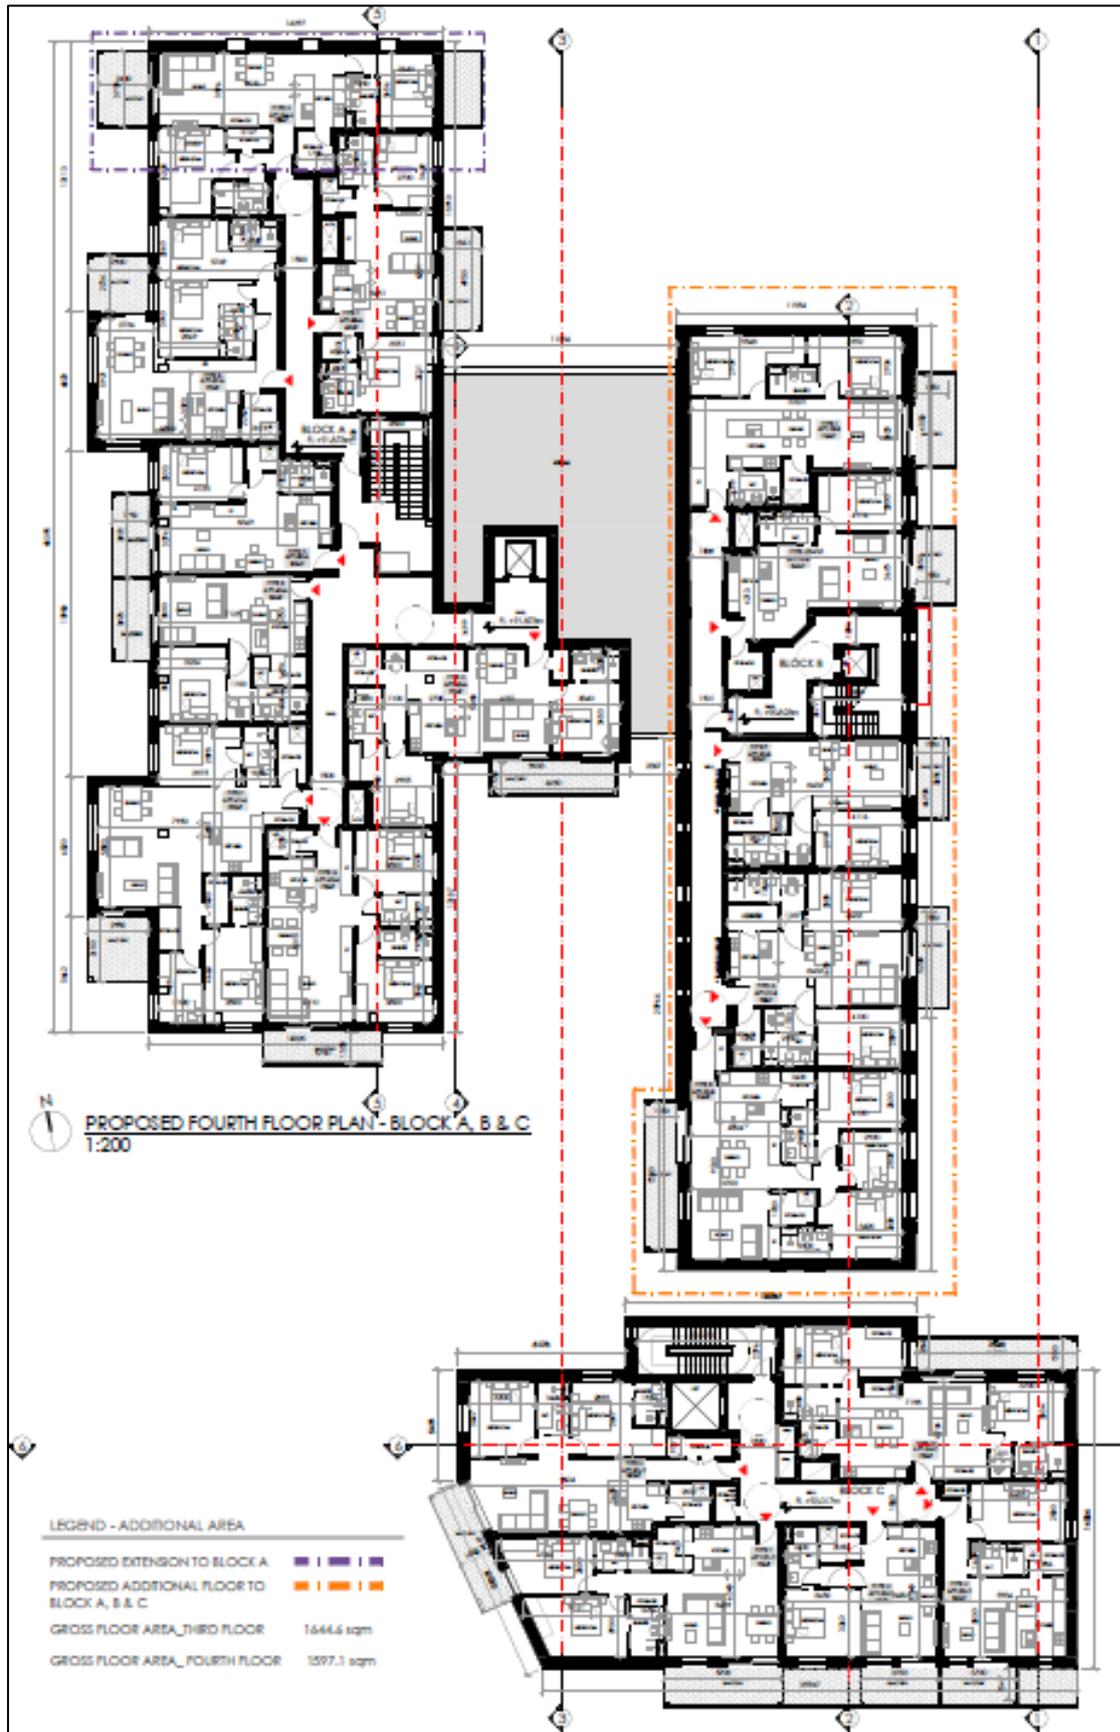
Fourth floor plan of the proposed Blocks A, B and C
